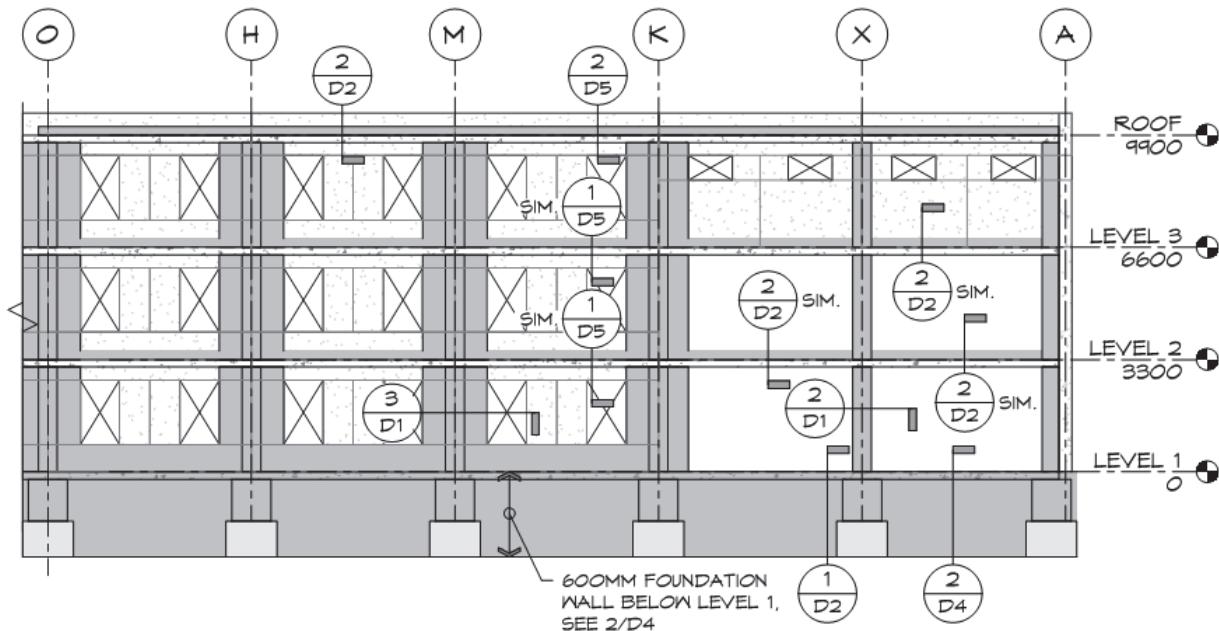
Longitudinal wall fingers added in PC Increment 3.
